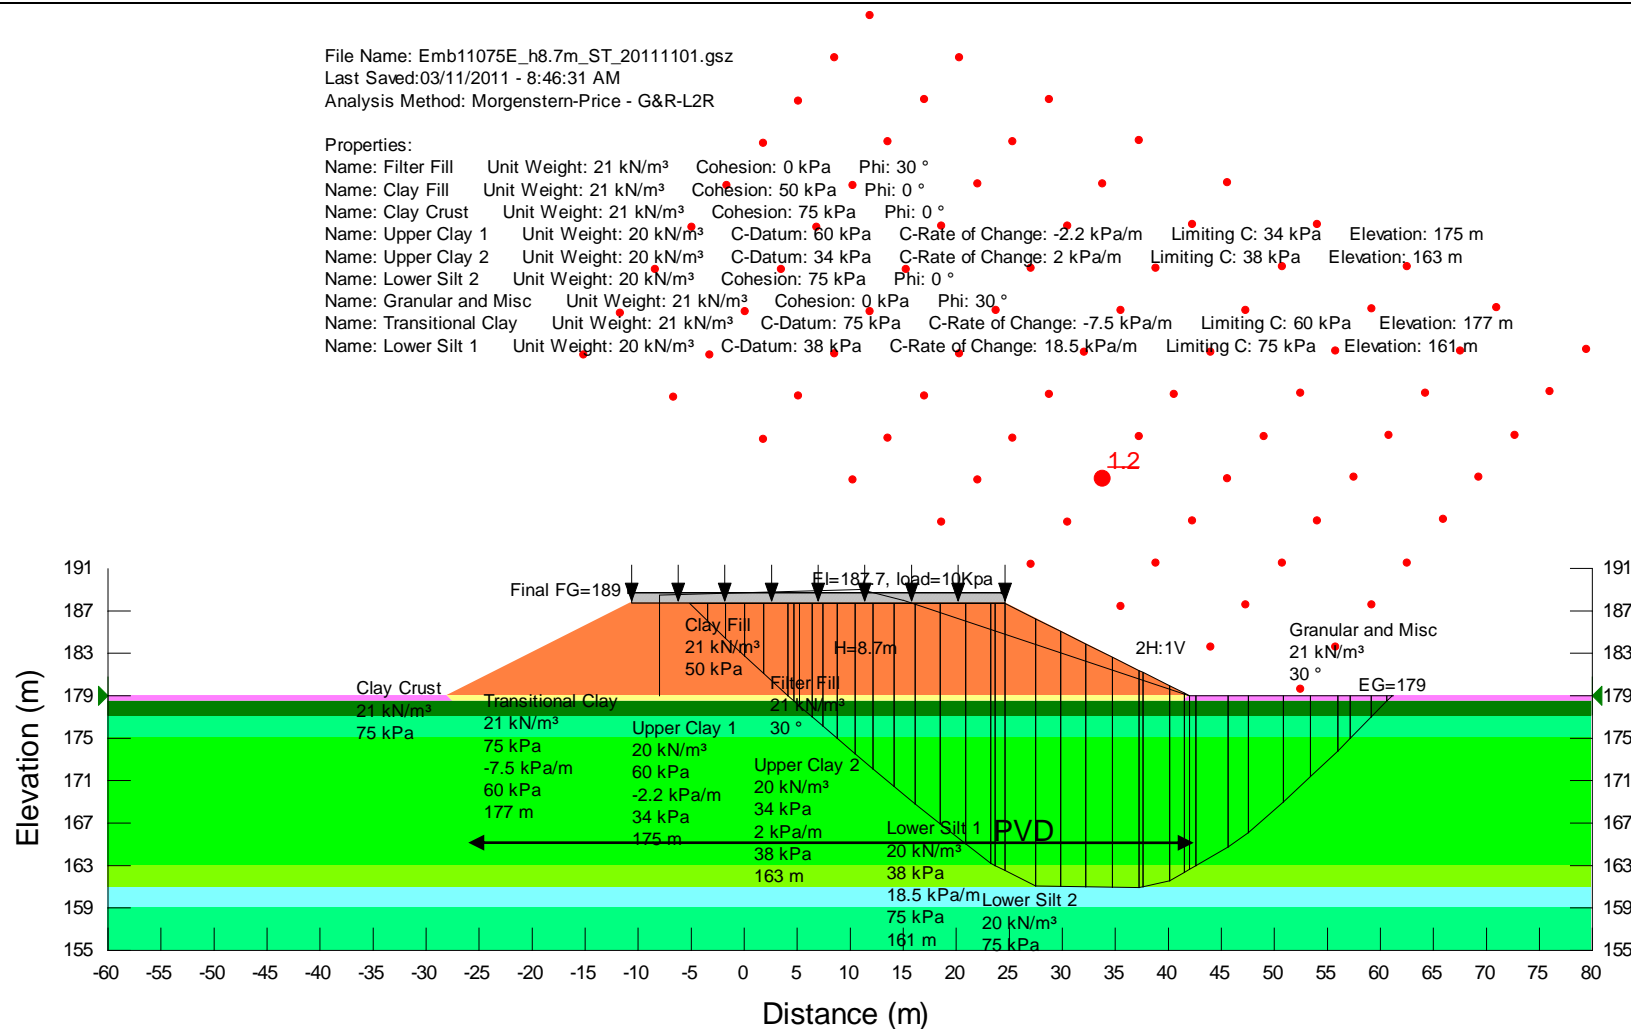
Slope Stability Result – Section 3 (Sta. 11+075E) – Stage 1 (El=187.7) – Short-term Loading
